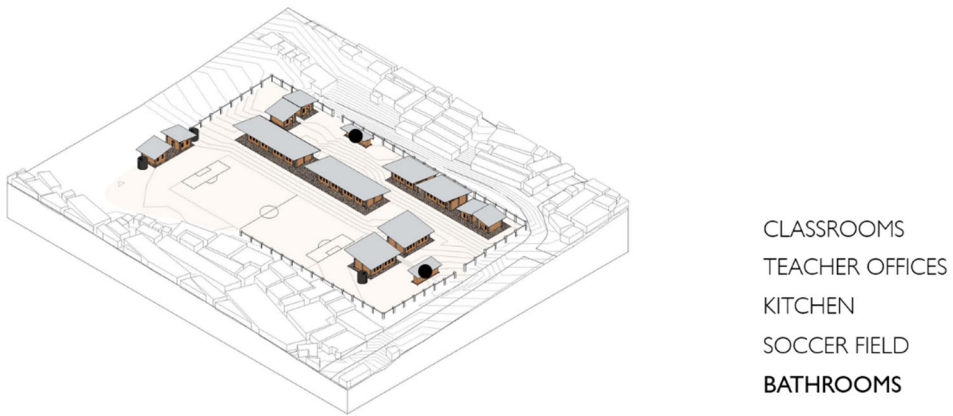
Isometric Site Plan- Highlighting Bathrooms
